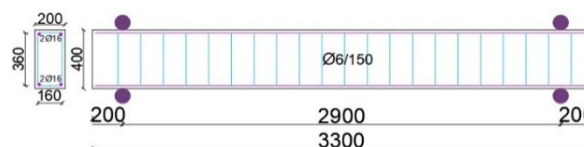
The dimensions and rebar arrangement of the RC beam.
